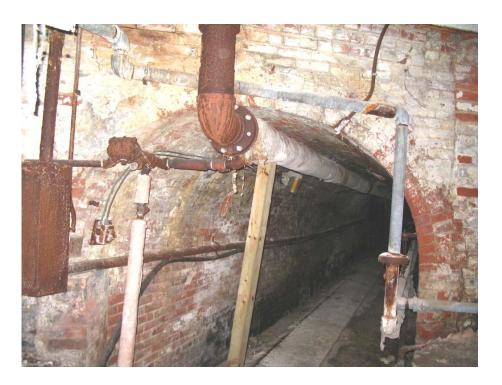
Corrosion on steam and water pipes at west portal; Note timber support below steam pipe
